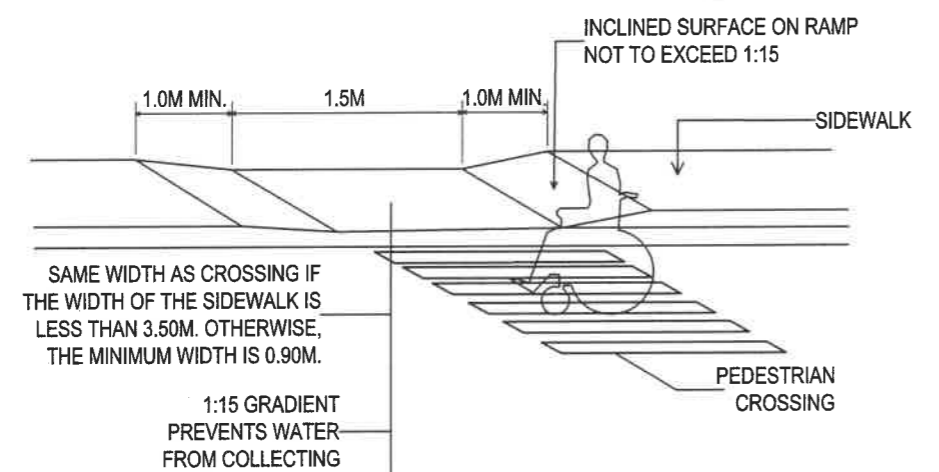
B: CROSS-SECTION OF DROPPED CURB
